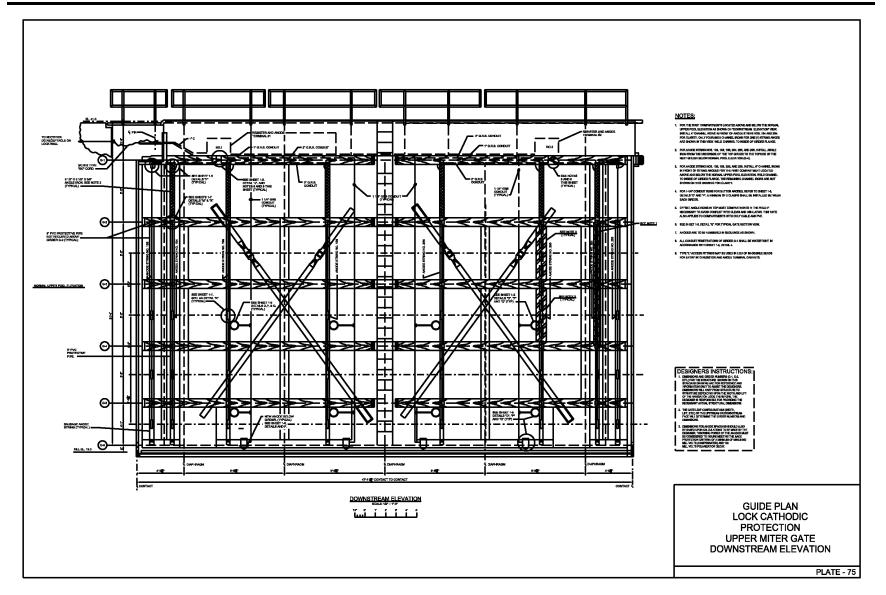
Plate 75: Guide plan, lock cathodic protection, upper miter gate, downstream elevation
